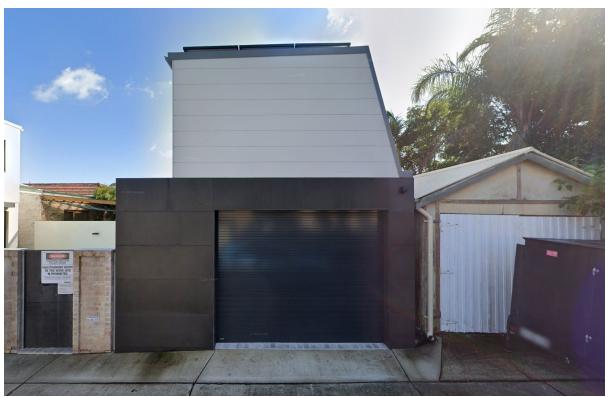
No. 22 South Street's two-storey outbuilding as visible from Dot Street and adjoining the subject site
